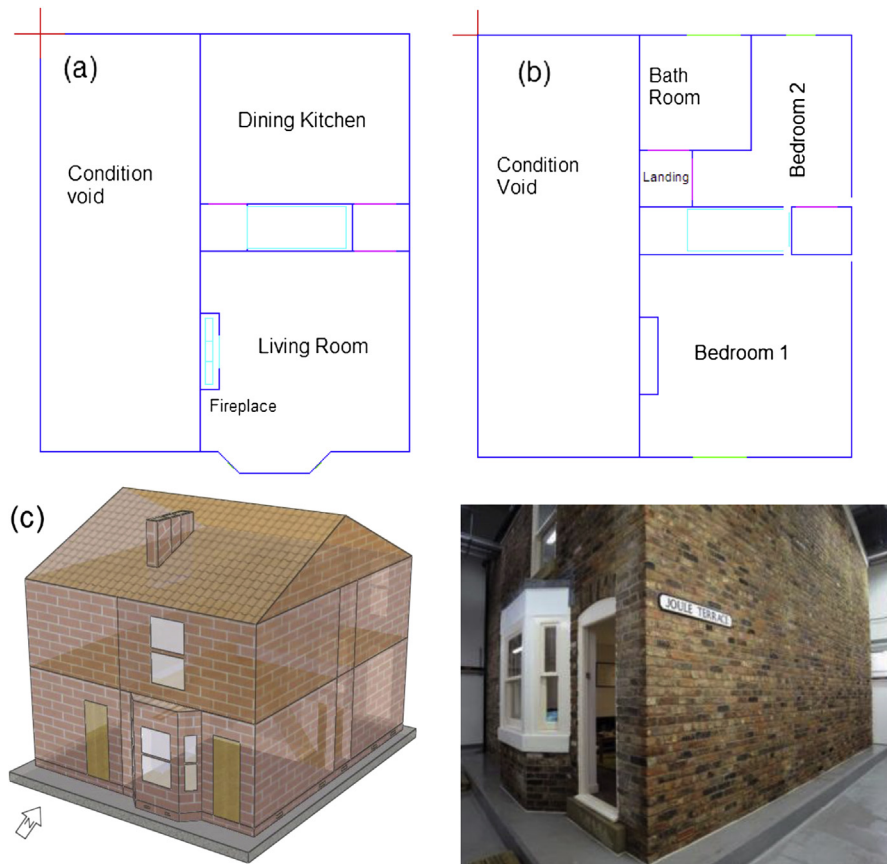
The EH model (a) ground floor plan, (b) first floor plan, (c) 3D model view, and (d) the EH in the lab.
